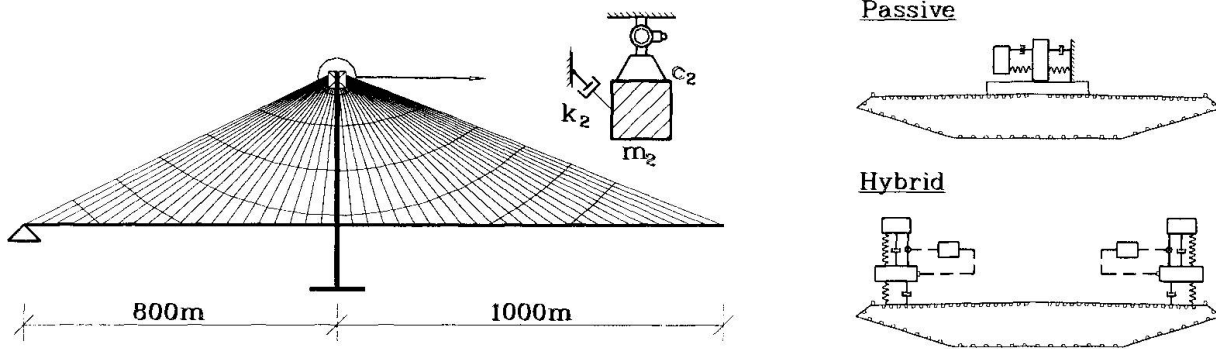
Cable-stayed bridge under construction (main span 2000m)
